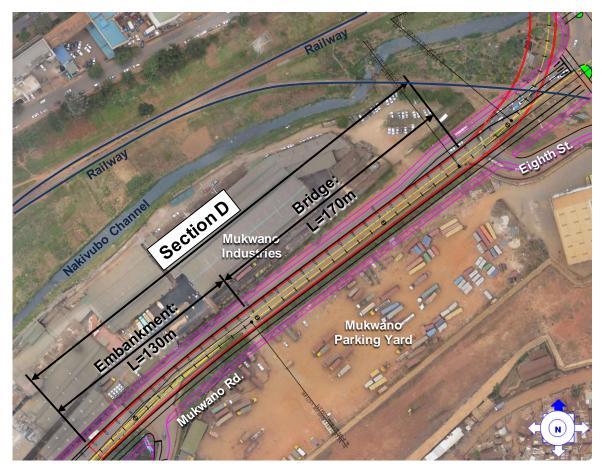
Section D: Straight section at Mukwano Road Source: JICA Progress Report 2
